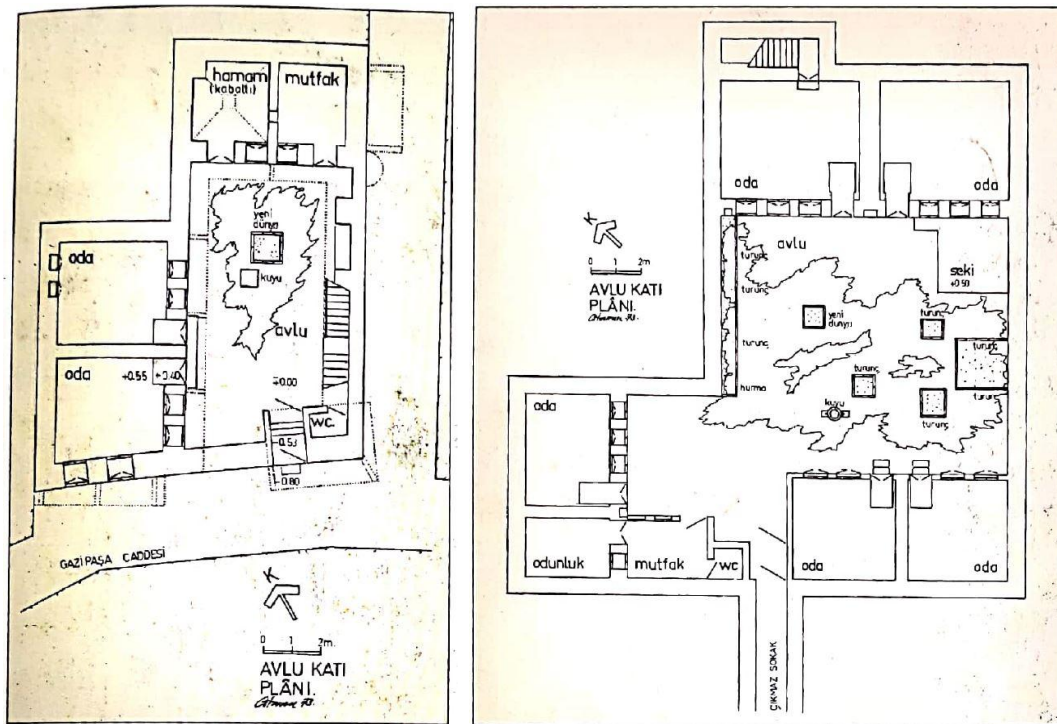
Some ground floor plans from the traditional courtyard houses of Antakya
